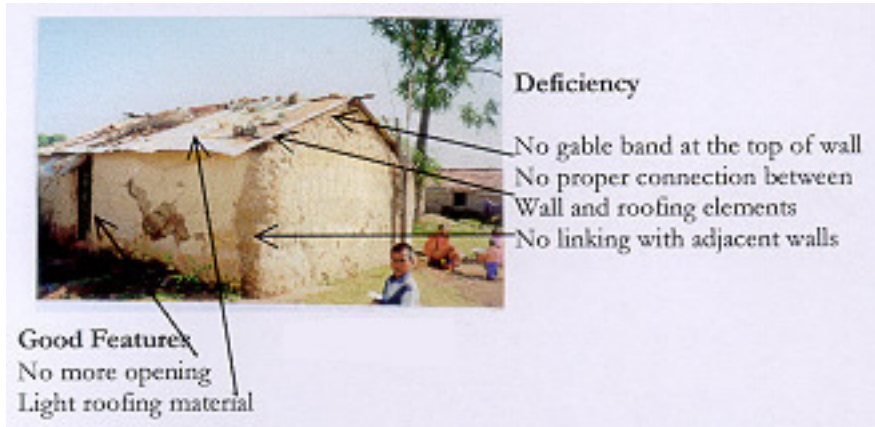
A: Typical Building (Source: Sudhir K. Jain, IIT Kanpur)
